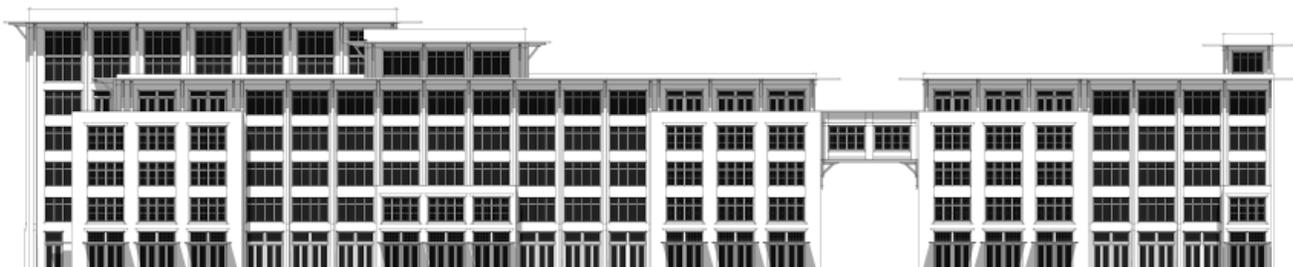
Example of Large Urban Buildings arranged on a Campus Block. Large Urban Buildings shall not have more than 6 repeated bays in a series and consecutive buildings shall vary in length.
